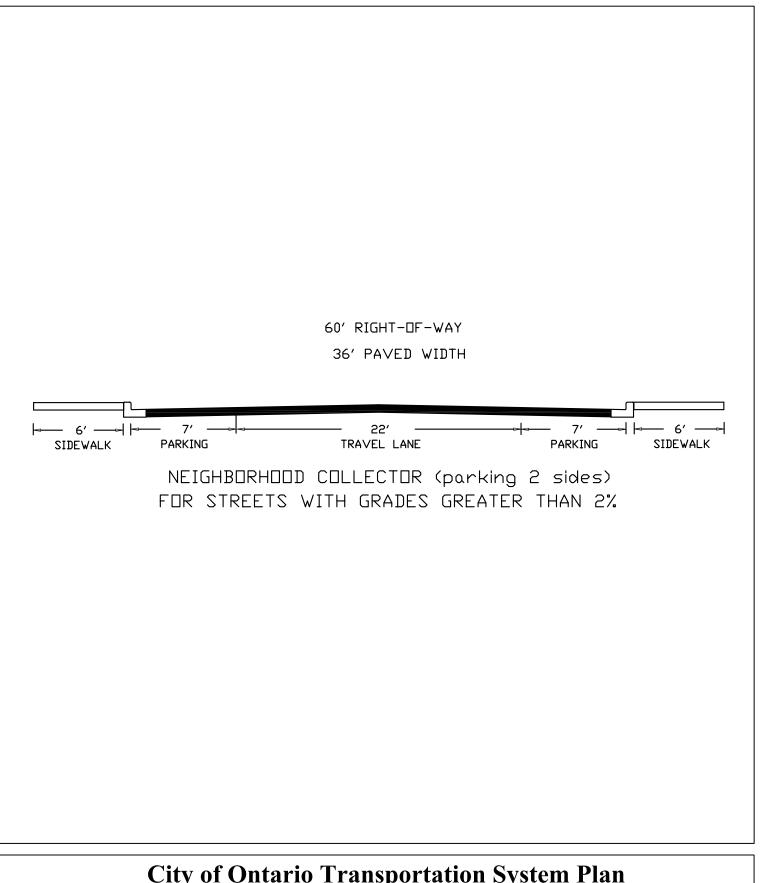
Typical Roadway Cross Section Standards Neighborhood Collector Greater Than 2%
